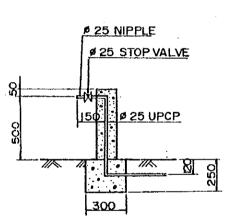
DETAILED PLAN OF UPSIDE WATER SUPPLY FACILITY
